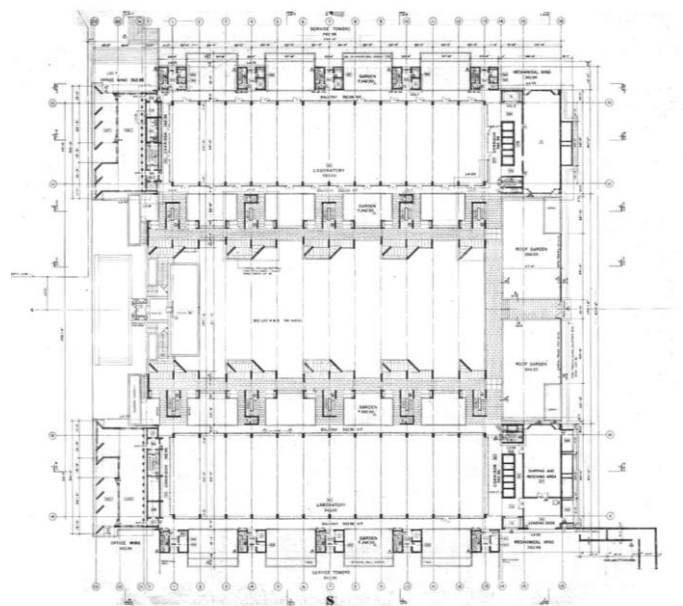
Salk Institute for Biological Studies, floor plan (URL7)
